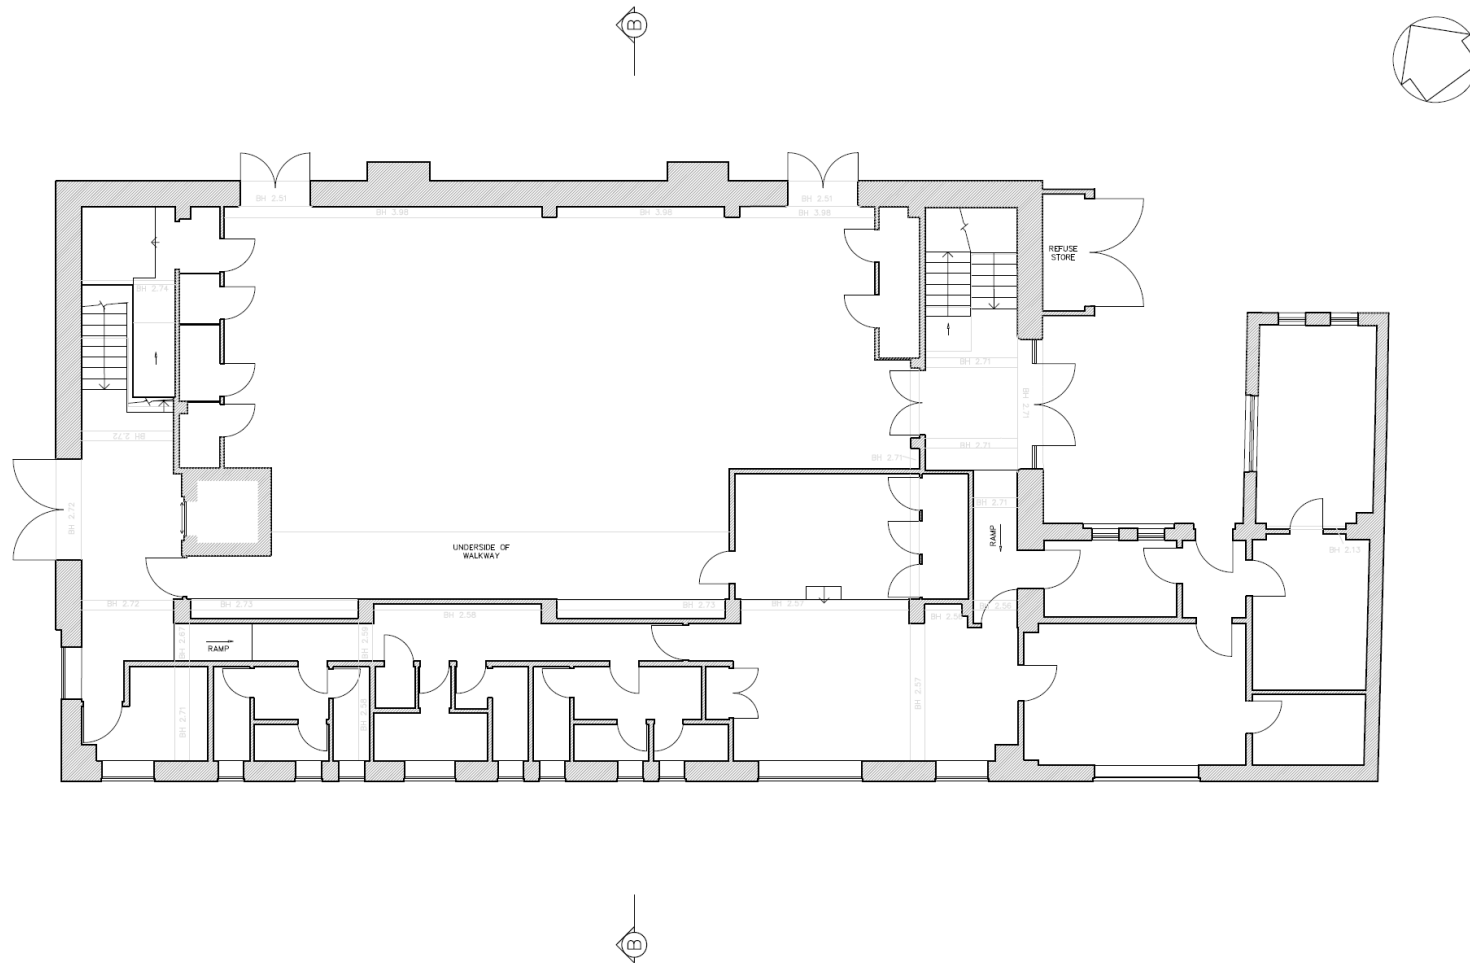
Architectural Plan Pre-retrofit Mayville Community Centre Ground Floor
